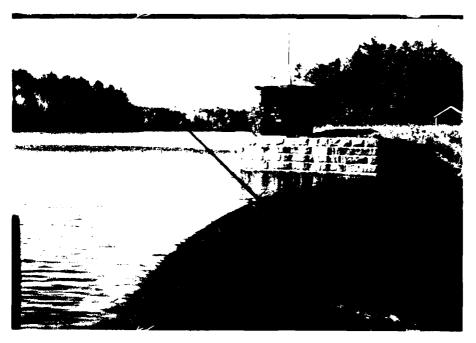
Overflow Spillway looking from Right Abutment Area.
